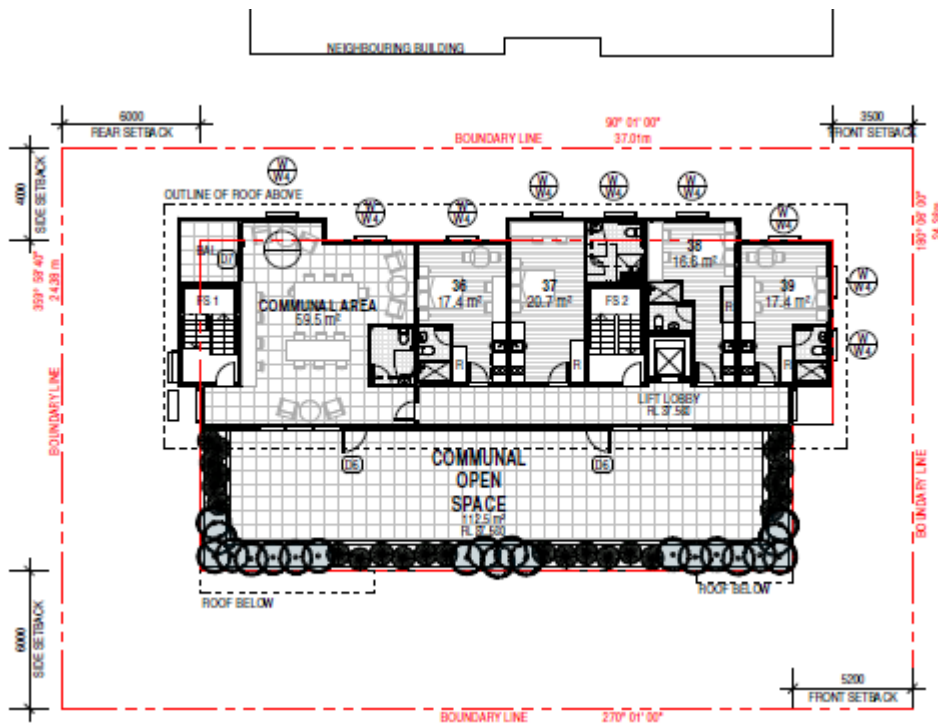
Original Level 3 floor plan, which has been deleted under the amended proposal.
